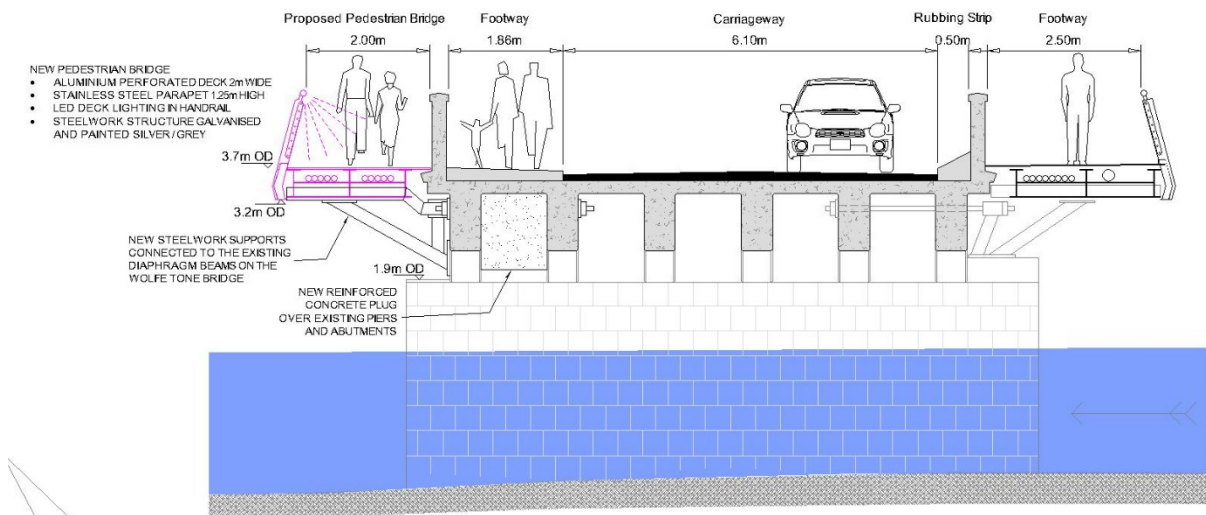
PROPOSED FOOTBRIDGE – INDICATIVE DESIGN
